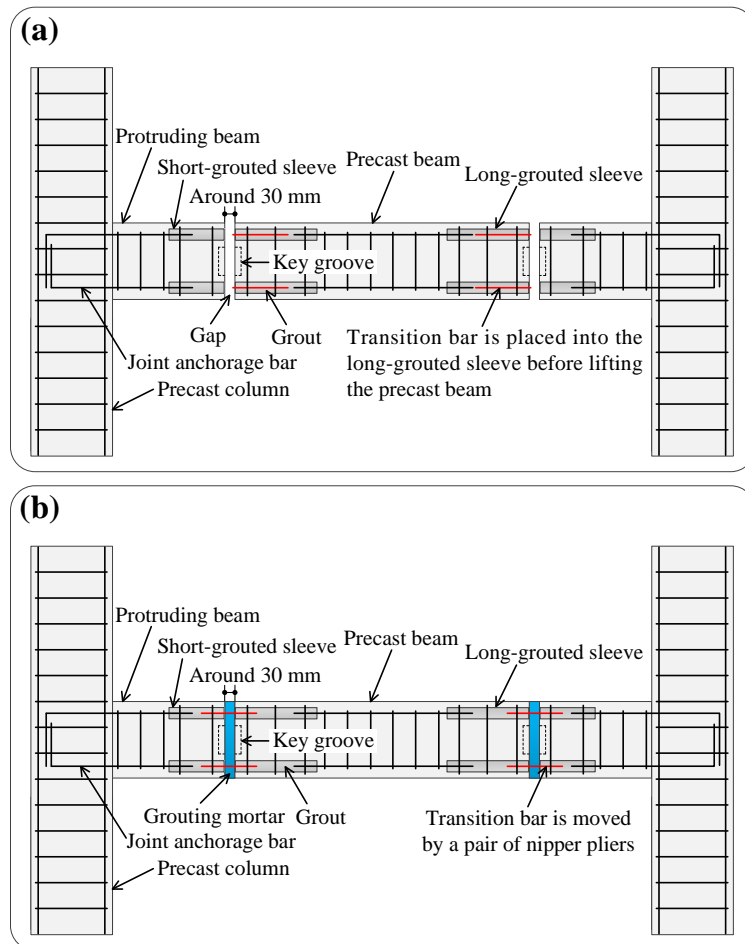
Schematic diagram of the developed prefabricated frame structure linked using double-grouted sleeve connectors: (a) precast column and beam in place; (b) after installation.
